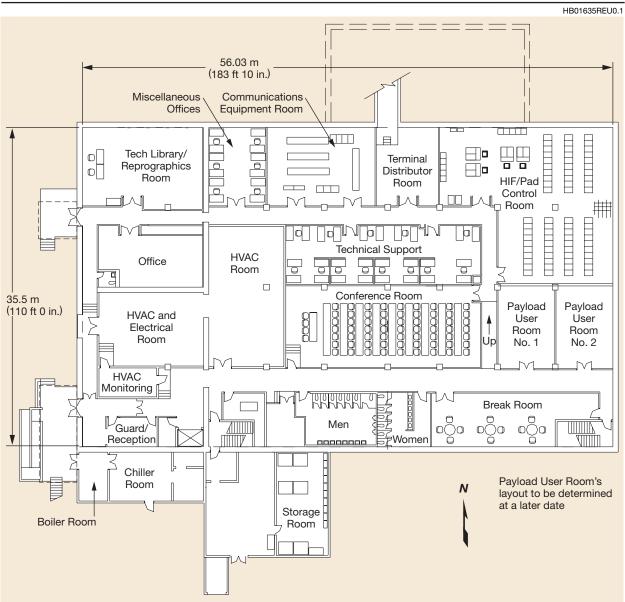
Delta Operations Center (DOC) First Floor (Building 392)
